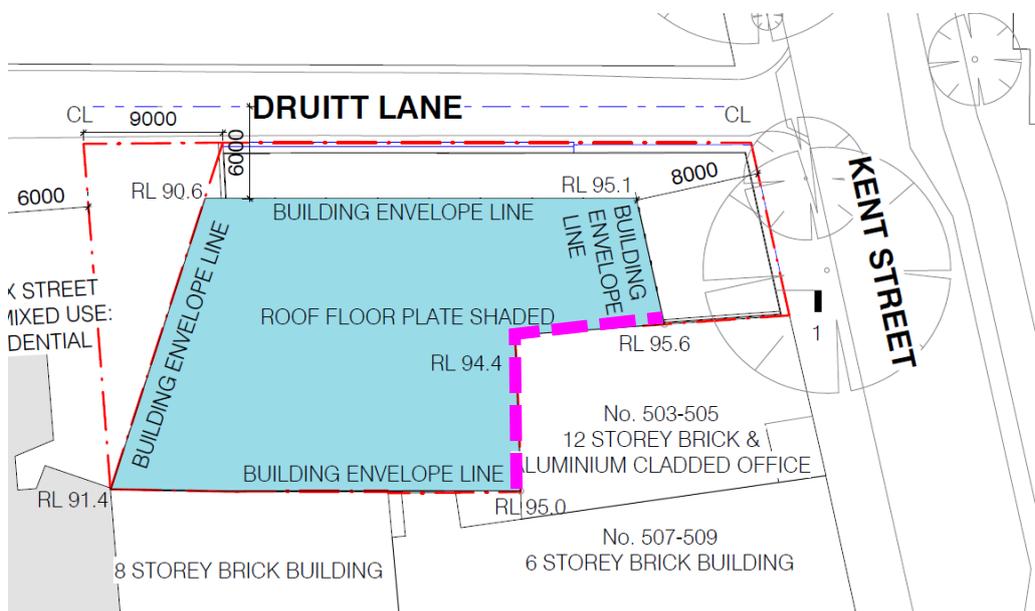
Concept envelope floor plan. Eastern and southern boundaries adjoining 503-505 Kent St marked in pink.
